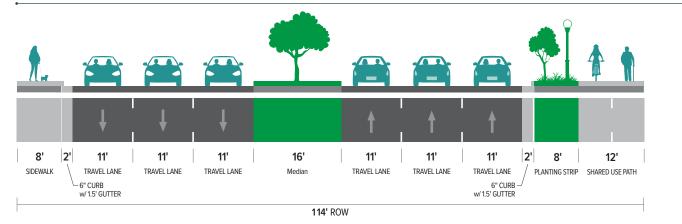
ALTERNATIVE 2 - TYPICAL CROSS SECTION
